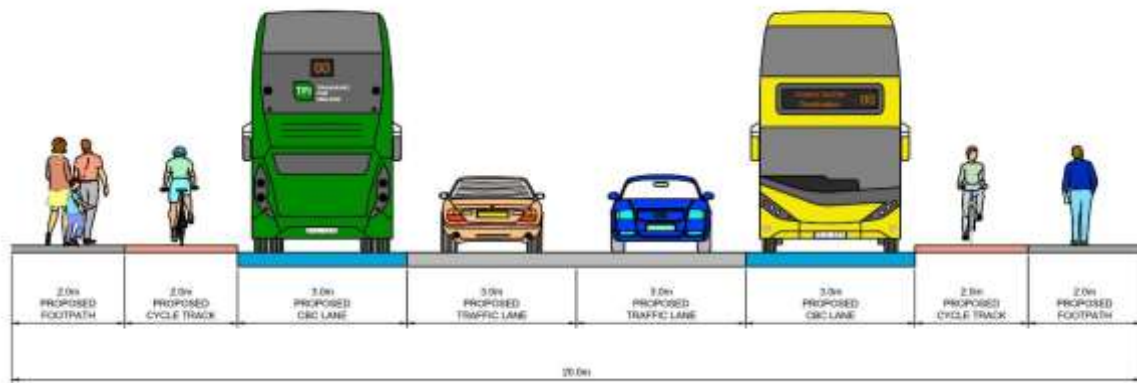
Typical Full Priority Cross Section (A - A, B - B, C - C)
